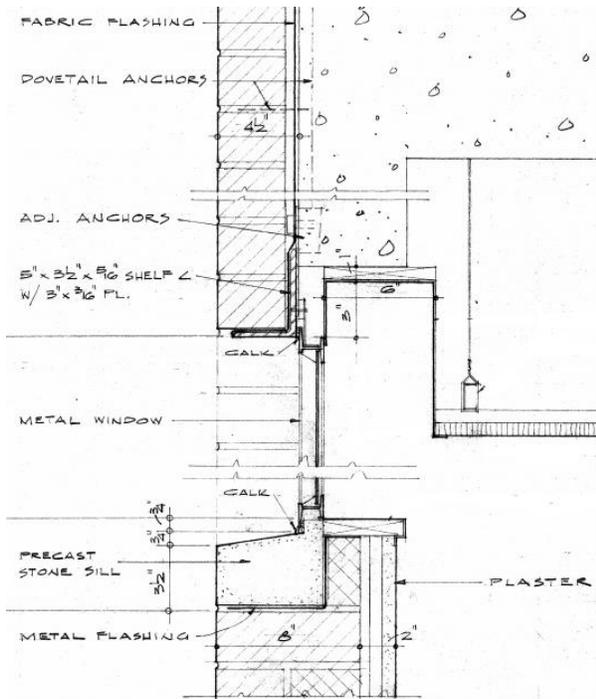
Section through typical exterior wall in existing building. From A.12: Window & Wall Sections
